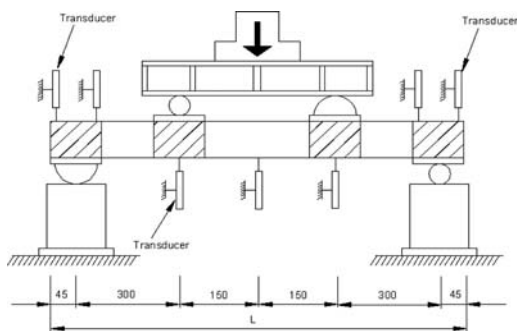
Test configuration for four-point bending tests (dimensions in mm).
